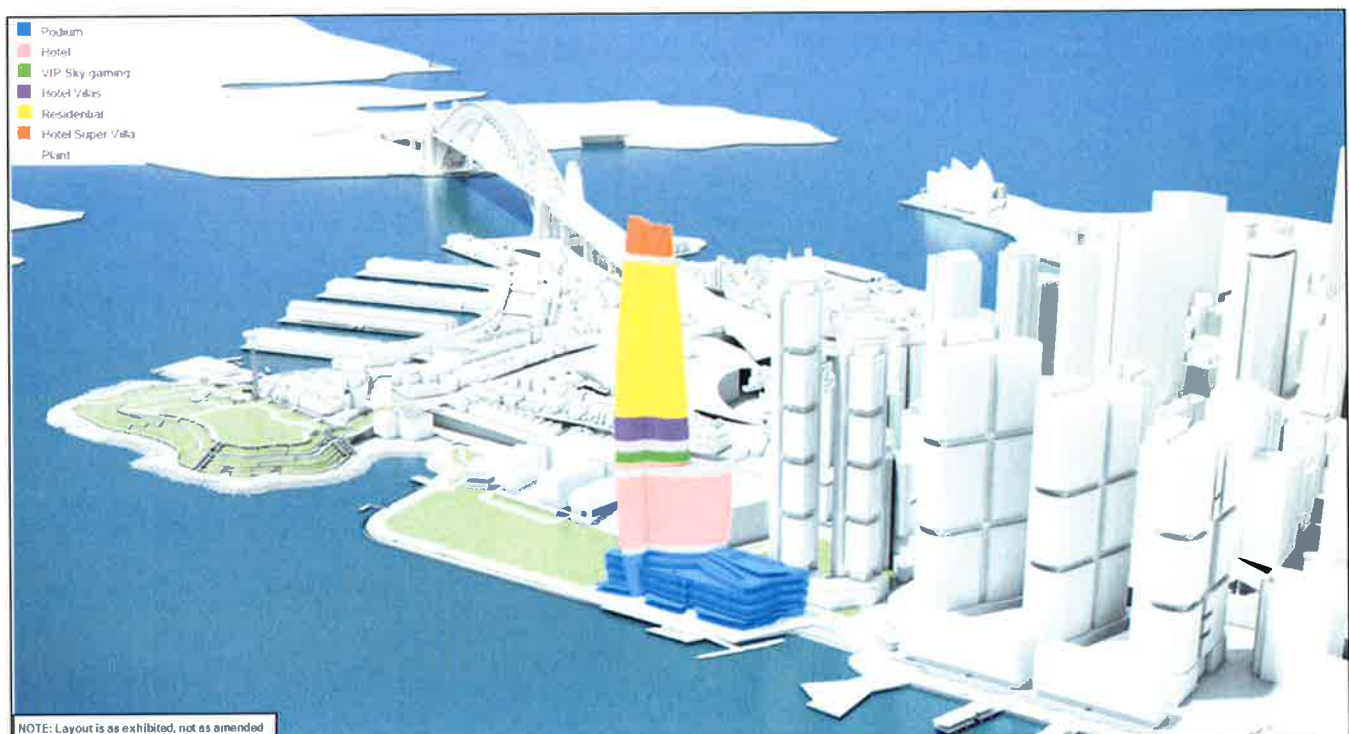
View looking south-east across the harbour to the site (Source: Applicant's EIS – as exhibited)
